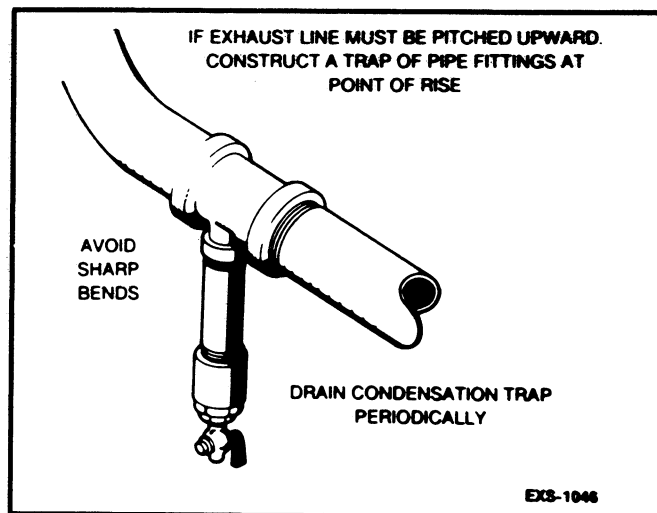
EXHAUST CONDENSATION TRAP
